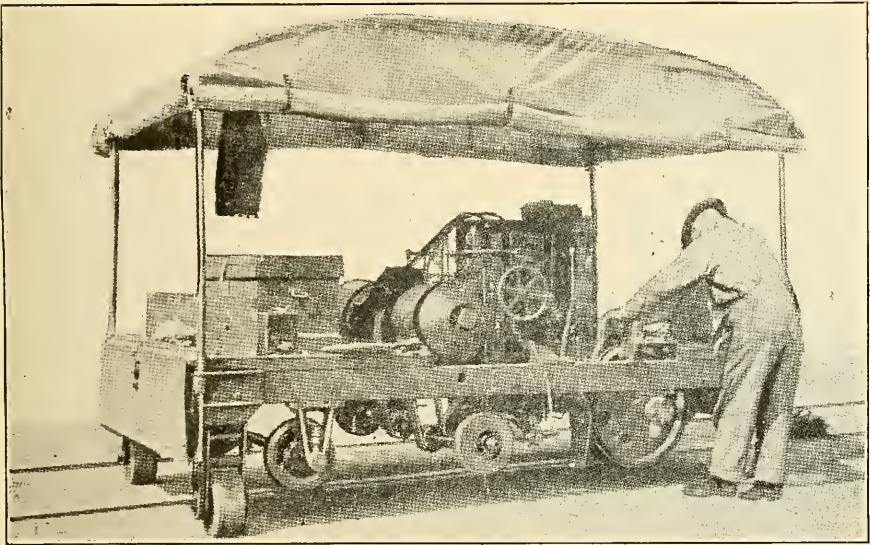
Rail-Grinding Machine Derailed Under Its Own Power.
